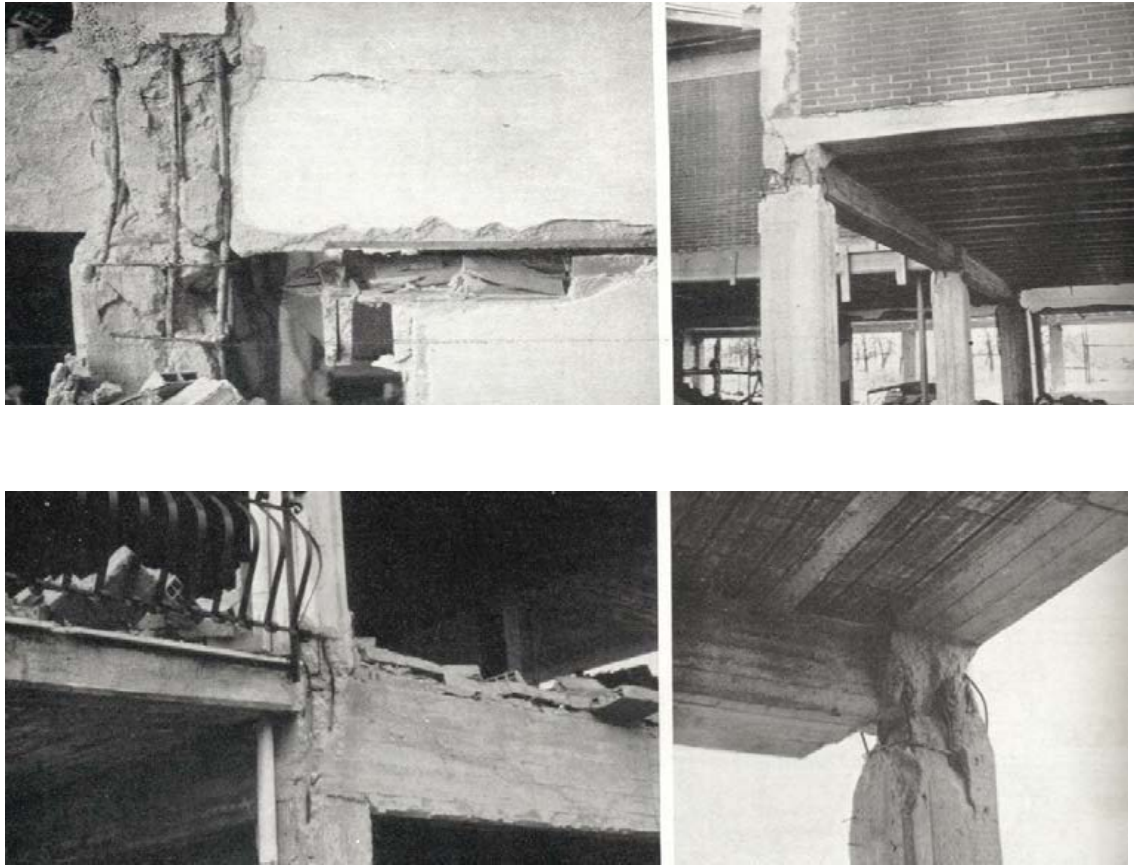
Irpinia earthquake (1981), beam-to-column joint failures.
